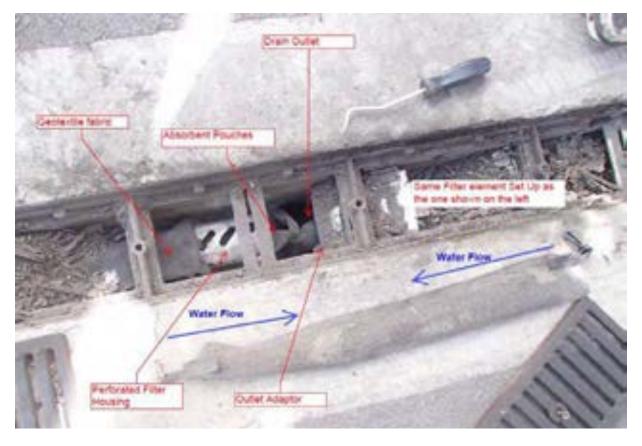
Pier 31 Trench Drain Filter BMPs
